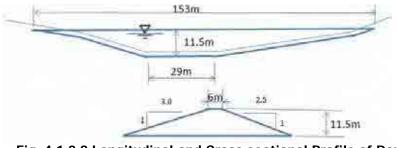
Longitudinal and Cross-sectional Profile of Dam
